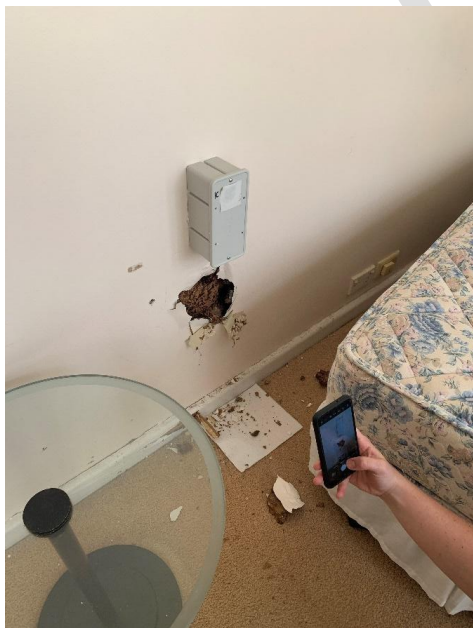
White ant damage (termites) of shared internal wall between the original bedroom and bathroom.
